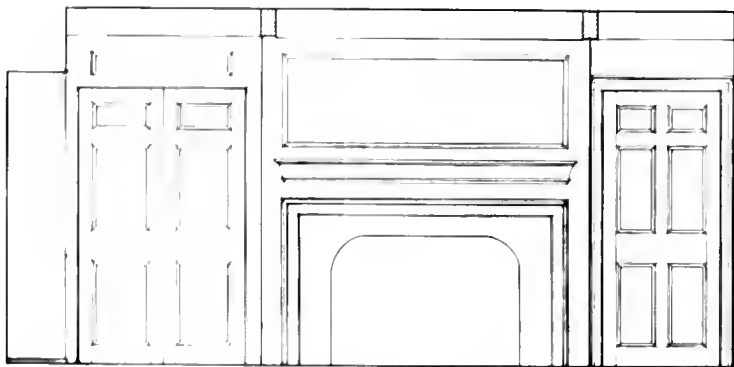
Dining Room, North Elevation. This wall has gone through many changes in design since Colonel MacFarlan's pencil rendering. It is possible that the second Brigadier or Charles T. Owsen's final design is better, but this is how the wall exists today.
